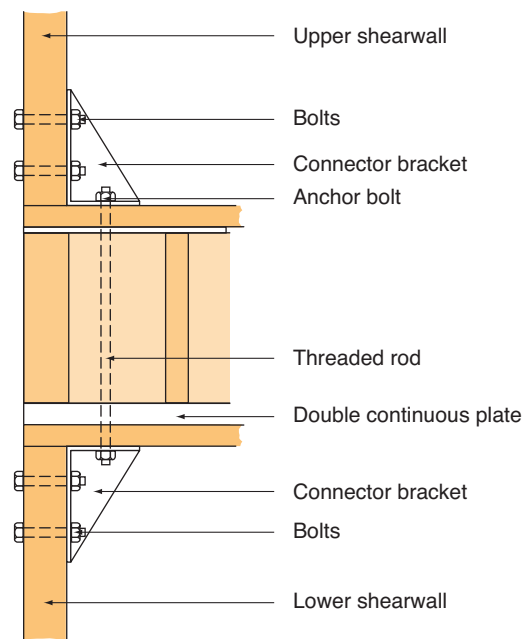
A suggested method for connecting the end of a wall to the floor beneath
